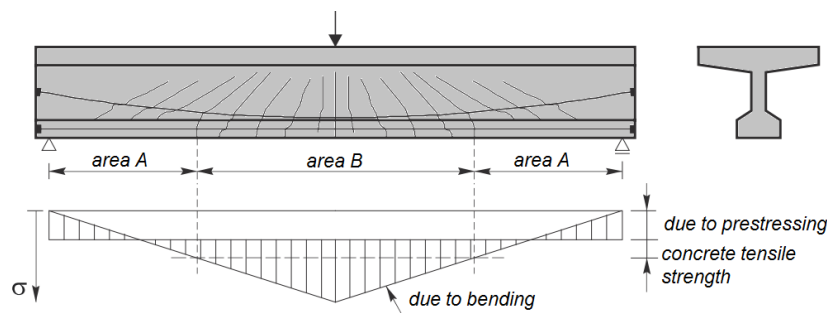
Crack pattern in a prestressed beam and the stresses in the bottom part [8]
